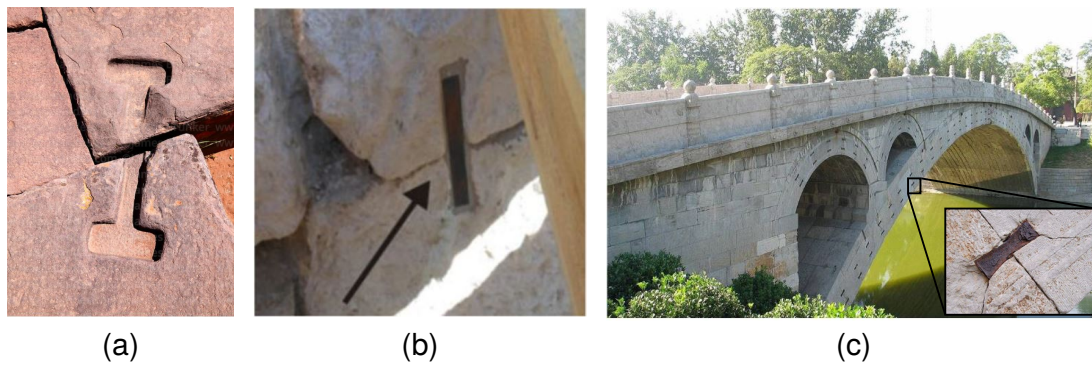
Historical evidence of metal clamps in stone masonry: (a) Inca civilization example, in modern-day Bolivia (at Puma Punku); (b) example from ancient Greece; and (c) example from ancient China (Zhaozhou Bridge built in 600 CE).
